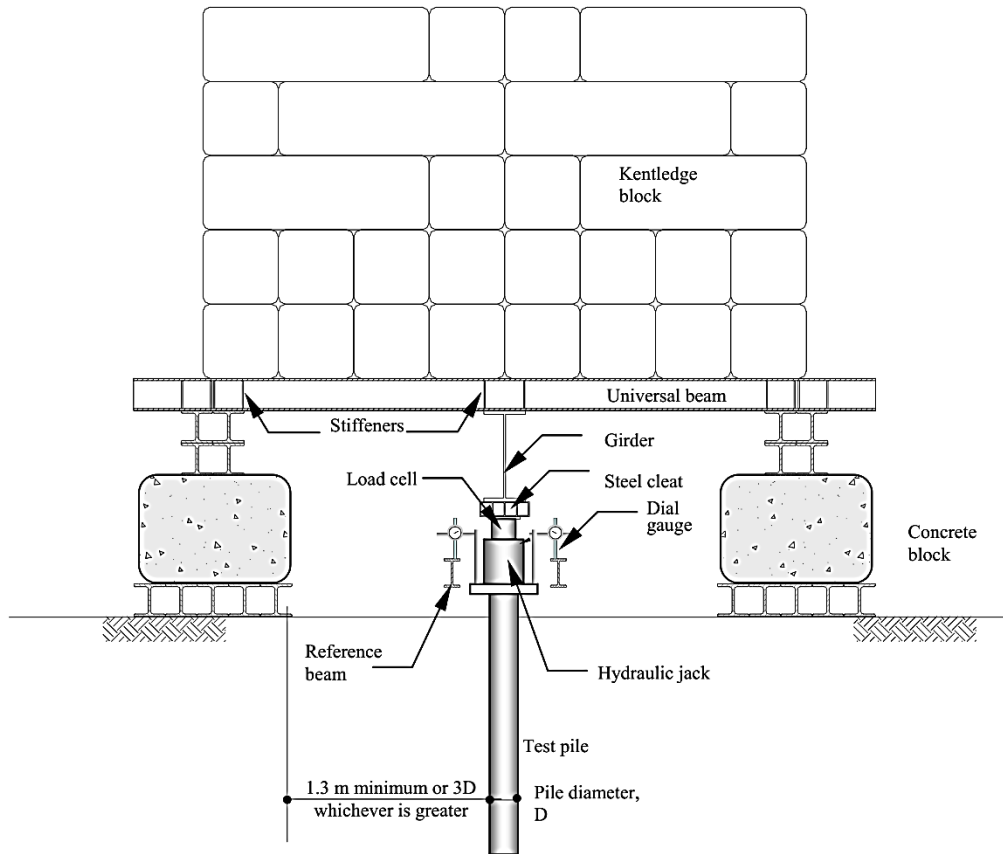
Typical arrangement of compression static load test (Hong Kong-Geo Publication No. 1/2006)
